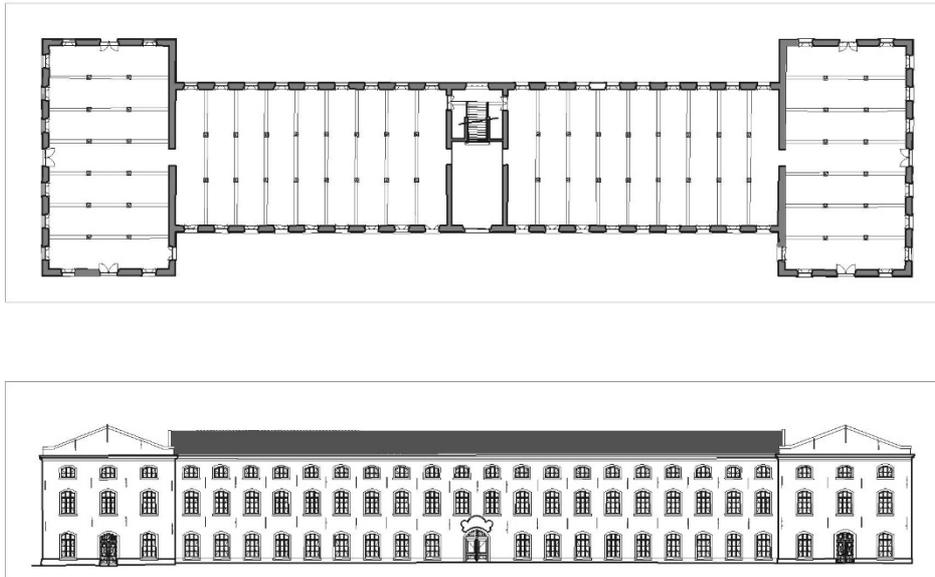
The Plan Layout and the Entrance Façade of Main Factory Building
